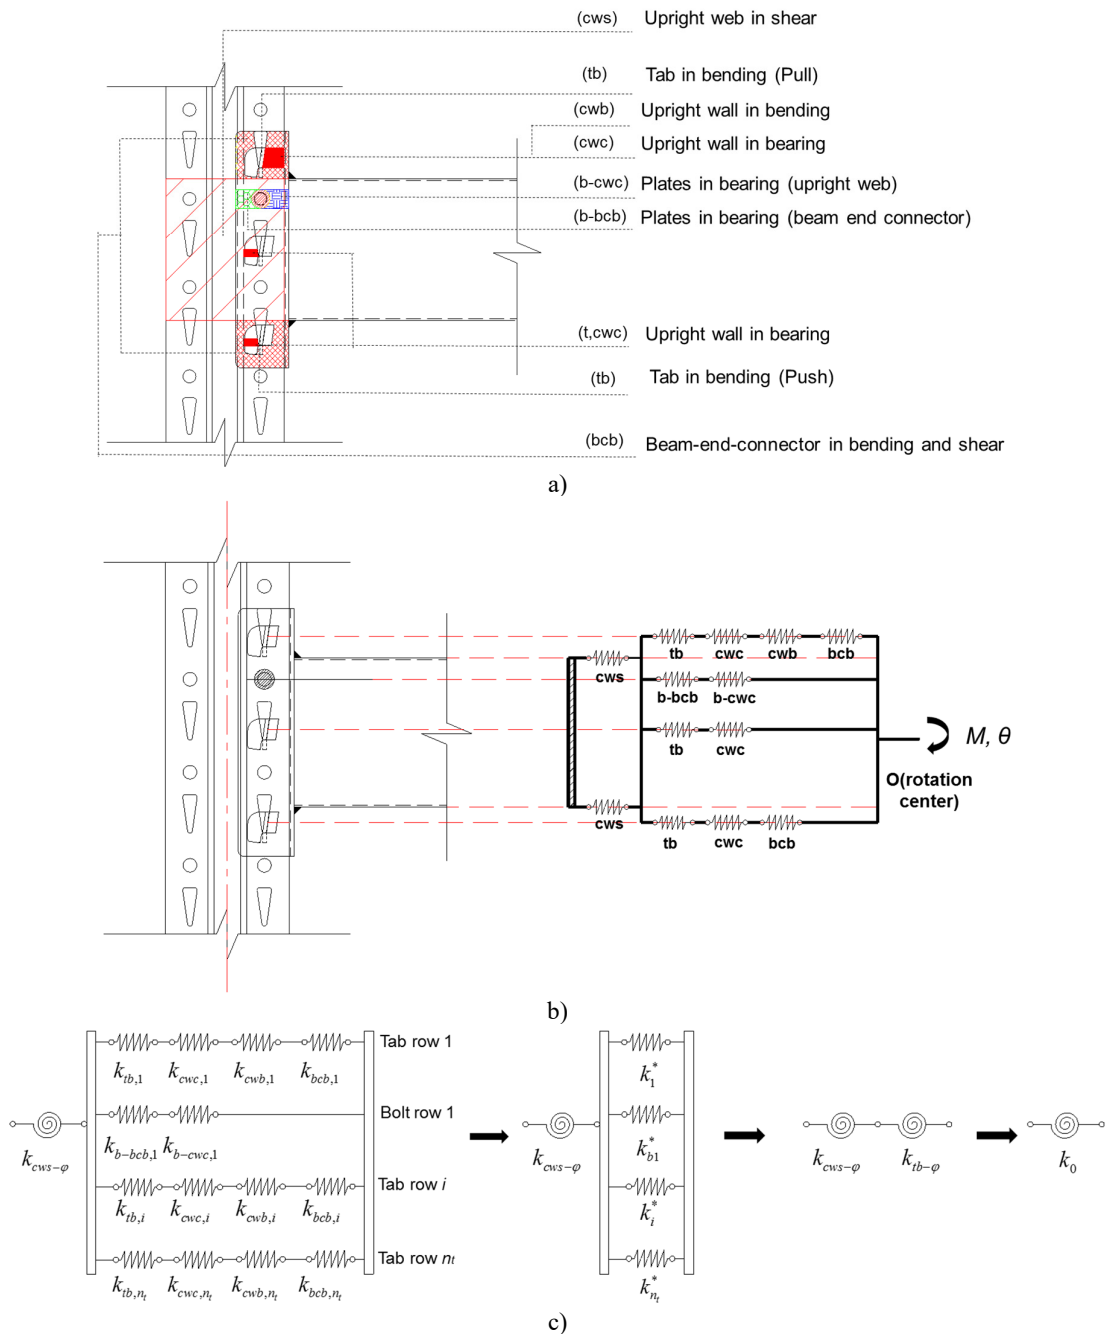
Component model of beam-to-upright bolted connections. a) Component identification; b) Mechanical model; c) Assembly of key deformable components
